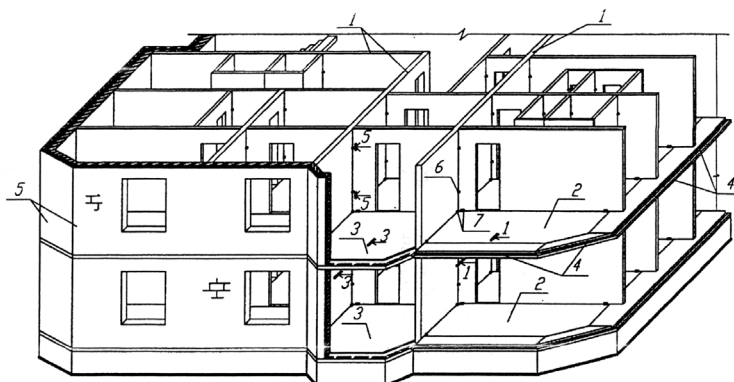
The building of the panel construction: 1 – longitudinal and transverse panel-frame; 2 – slabs; 3 – slabs with a perforated edge; 4 – girders with thermo-connectors; 5 – outer self-supporting one floor wall; 6 – starter bars; 7 – in-fill concrete
